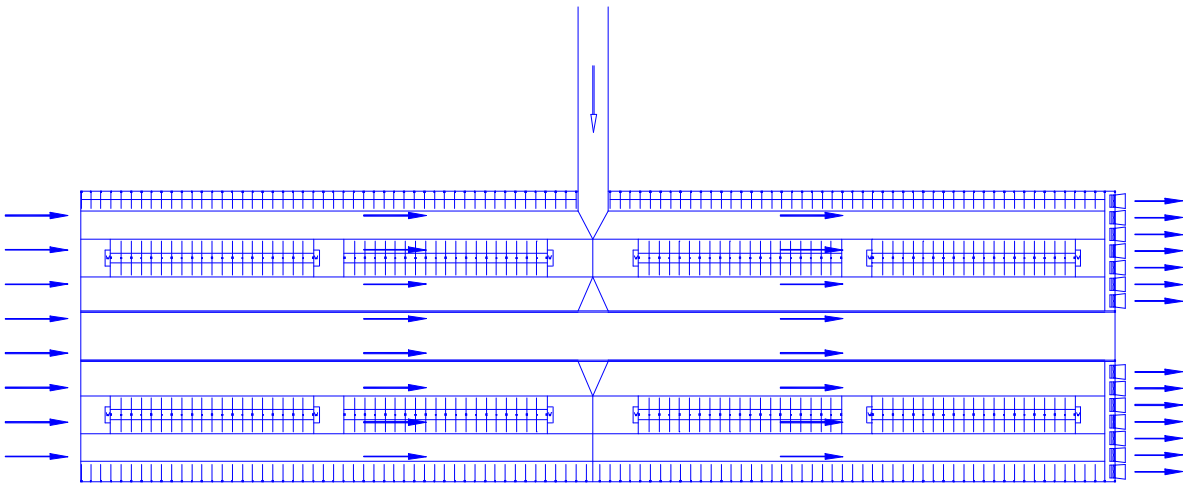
Plan View of A Typical Tunnel Ventilated Freestall Barn.
